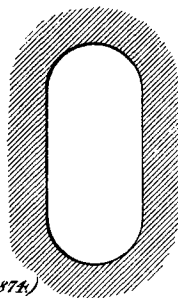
Transverse Section of Branch Suction Culverts to Pump Wells.
